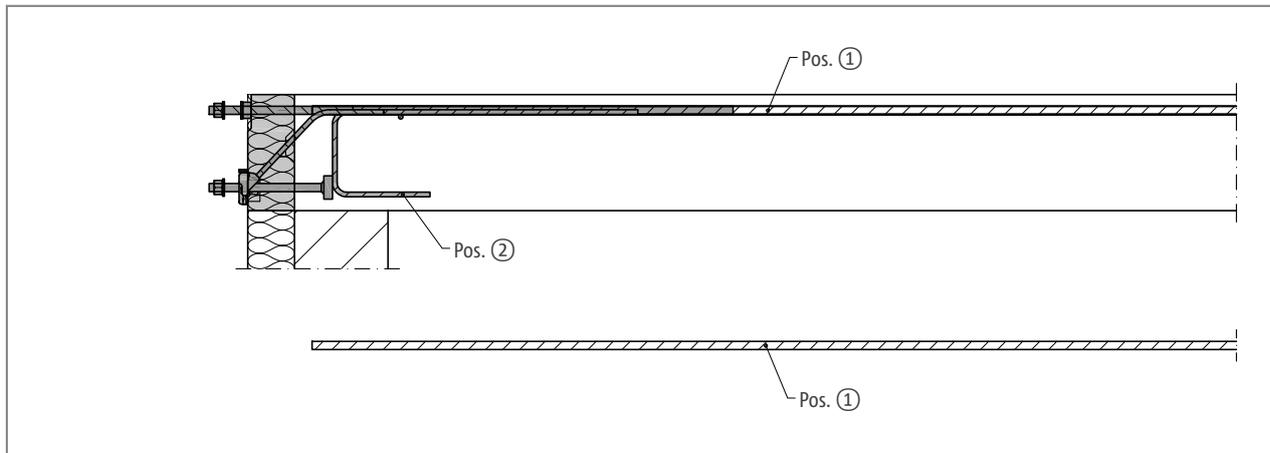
Schöck Isokorb® T type SK-M1: On-site reinforcement: Cross section
